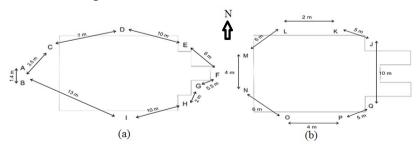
(a) markers placement on the ground floor of the building. (b) markers placement on the first floor of the building
